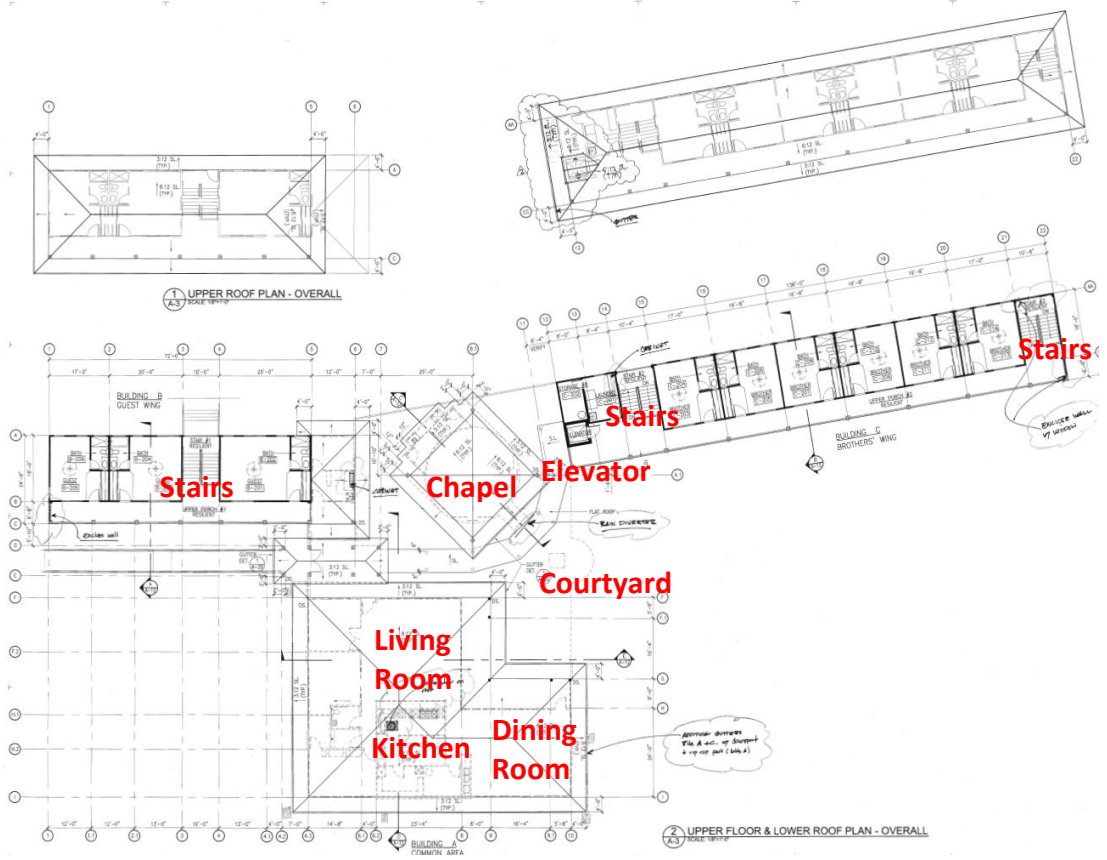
Upper Floor Plan and Lower Roof Plan¹⁷²
